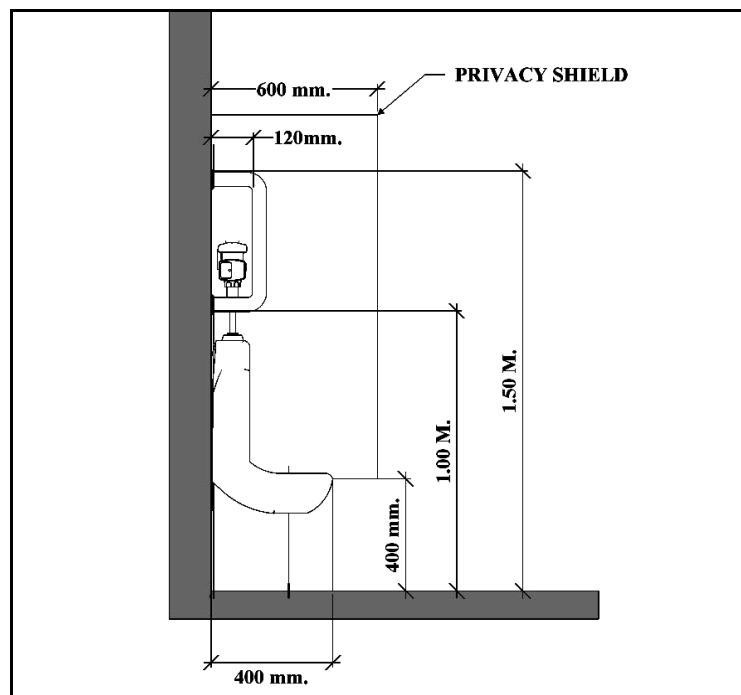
ACCESSIBLE URINAL (SIDE ELEVATION)
